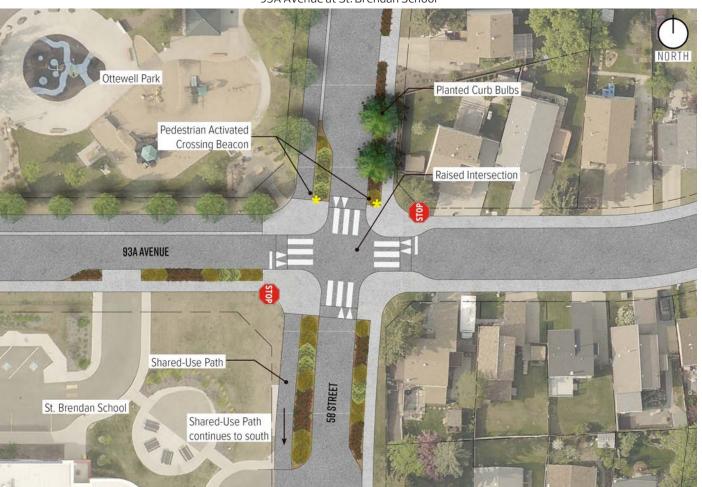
Intersection of 58 Street and 93A Avenue at St. Brendan School
